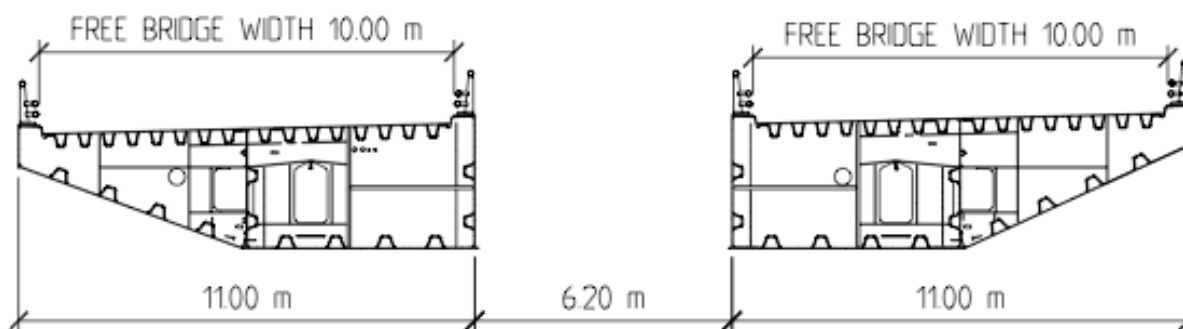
Girder cross section of the Svinesund Bridge [7].
